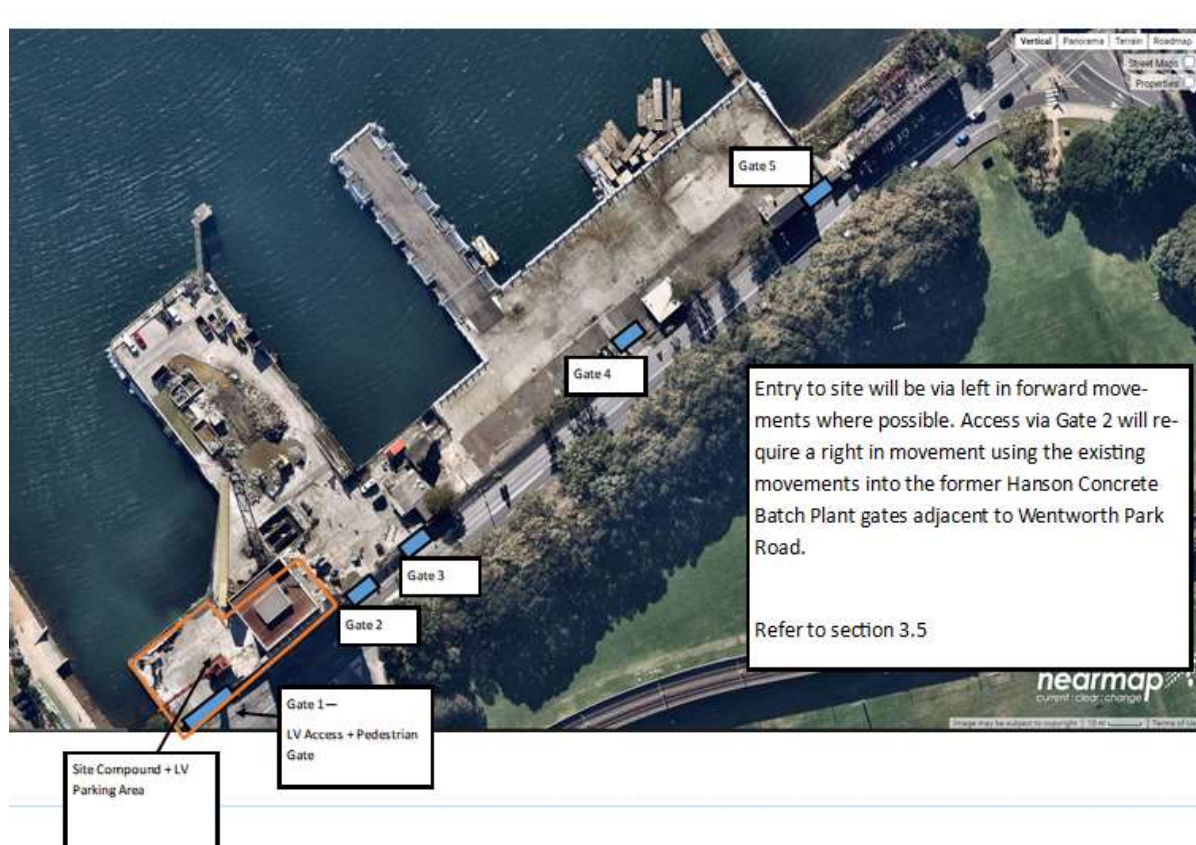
New Sydney Fish Markets Stage 1 Works - Location of access points to the site
